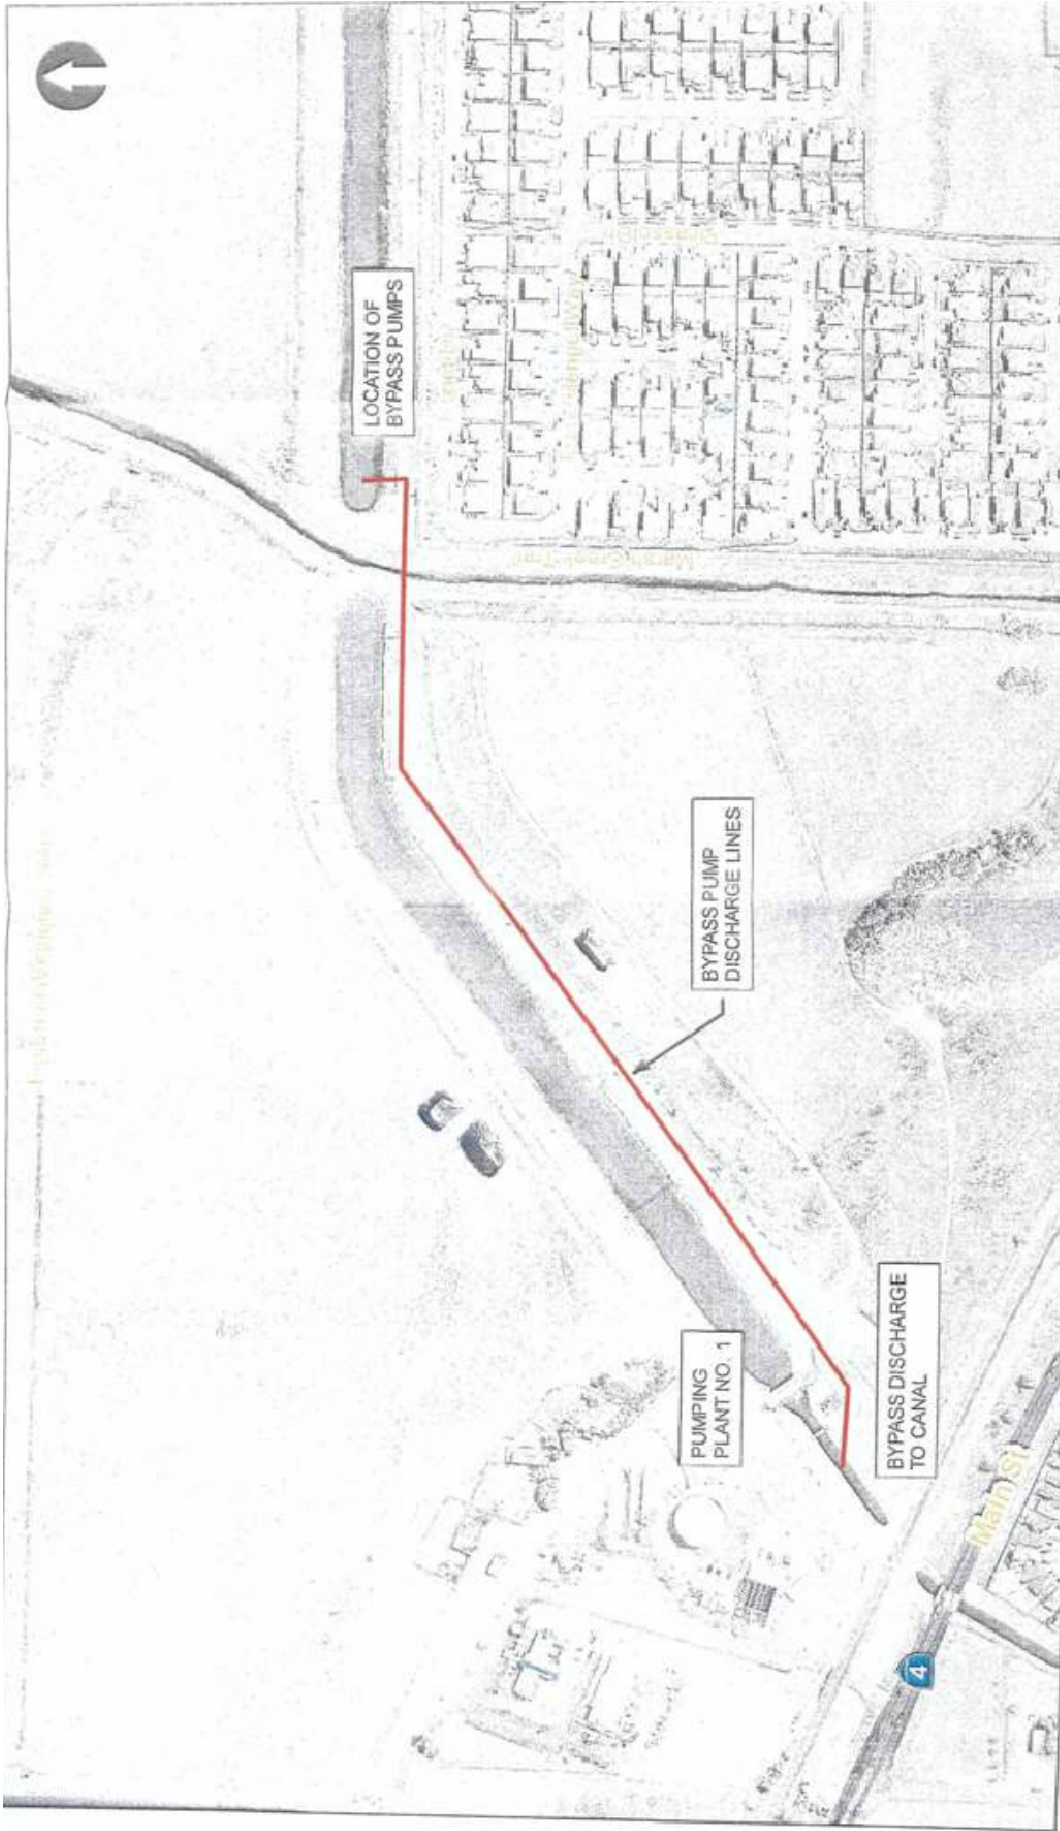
Site Plan- Canal Replacement Project Pump-Around Plan
